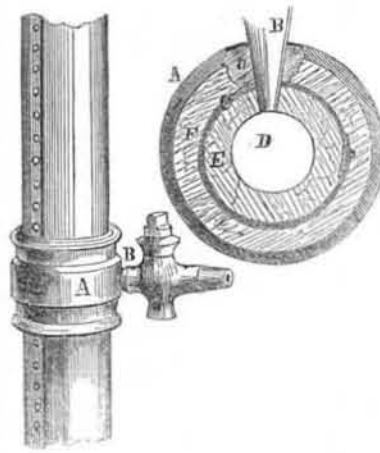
is a perspective, and figure 2 a transverse section through the tap and collar of J. Ball's patent water and gas pipe. This pipe is composed of an interior tube, E, made of prepared hydraulic cement, covered with a pipe of sheet iron, C, such as stove pipe, and which is riveted along its length, as shown in figure 1.
